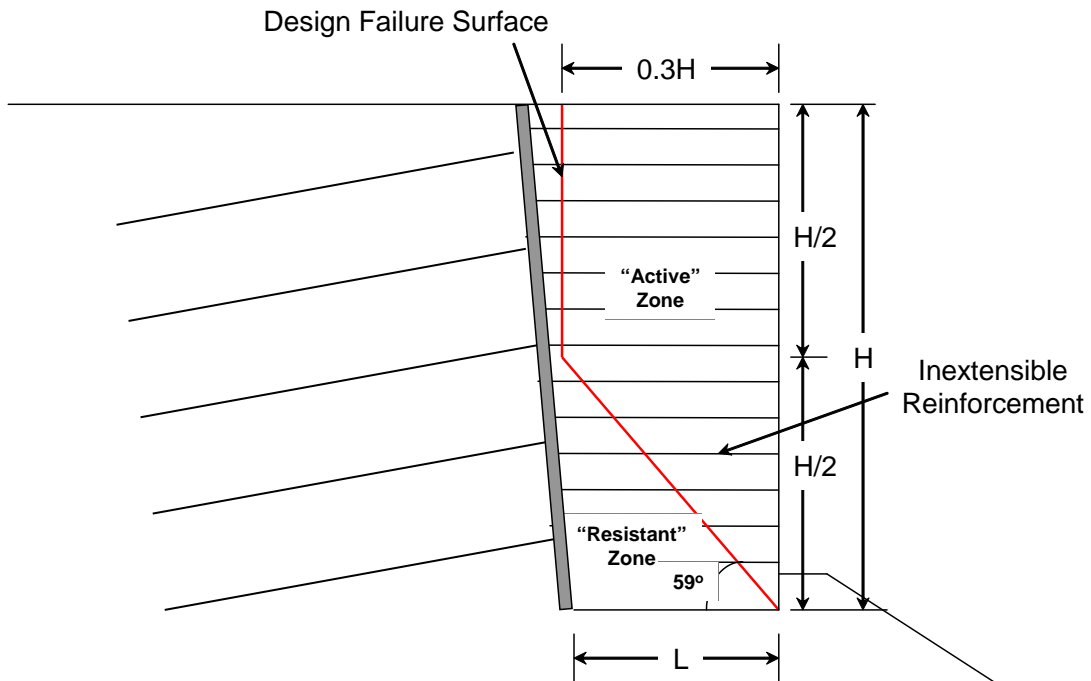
Diagram. Location of potential failure surface for internal stability design of MSE wall component with inextensible reinforcements.
